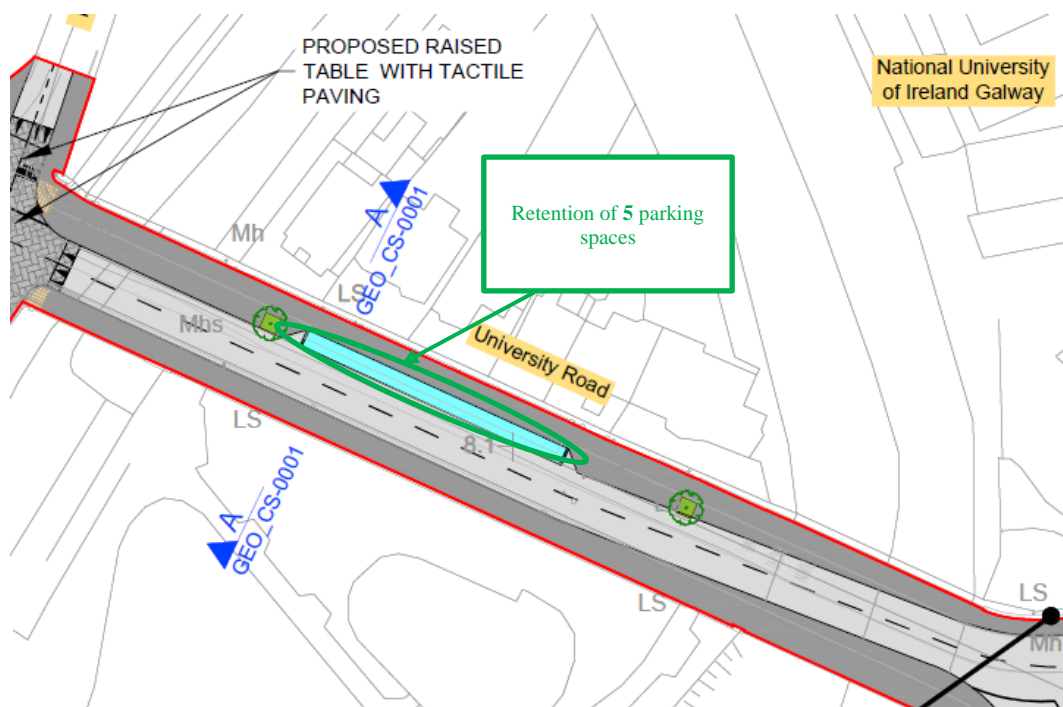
Proposed scheme design on University Road (opposite Millennium Children's Park and Playground)
